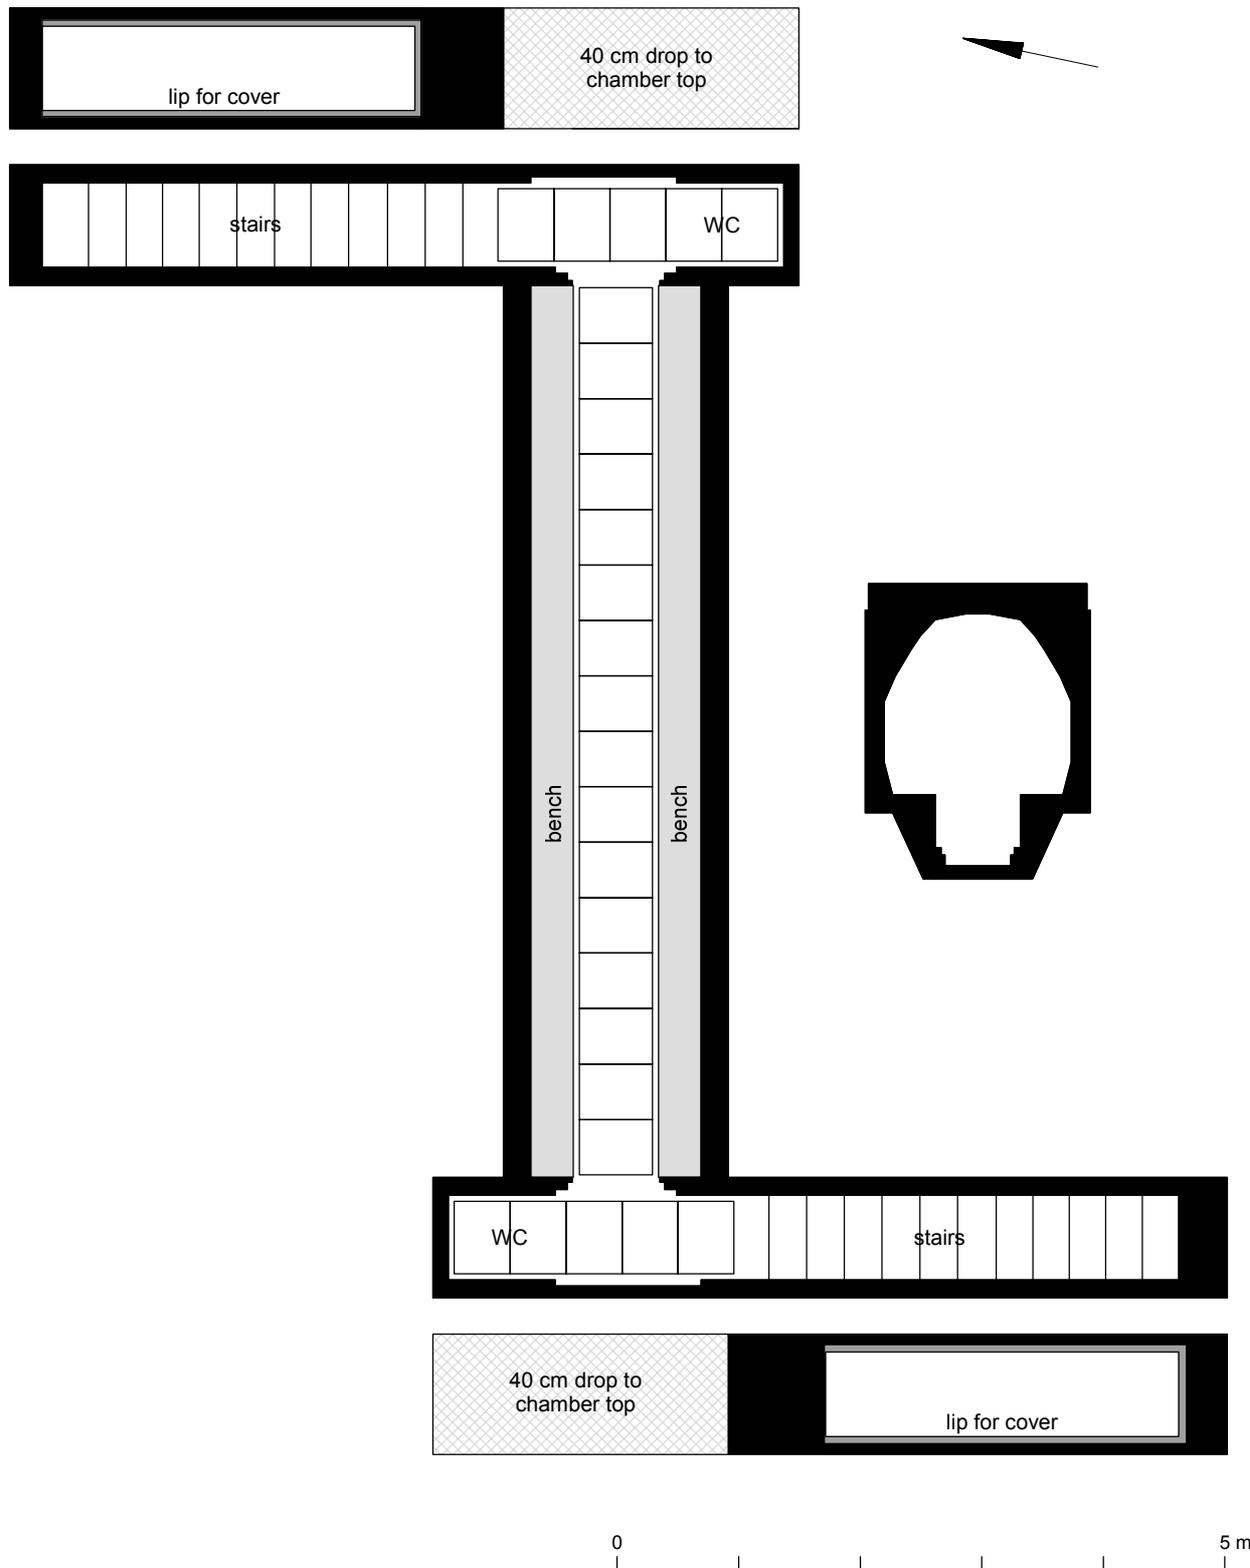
Area J1, air-raid shelter F9: internal plan and cross-section of chamber.
